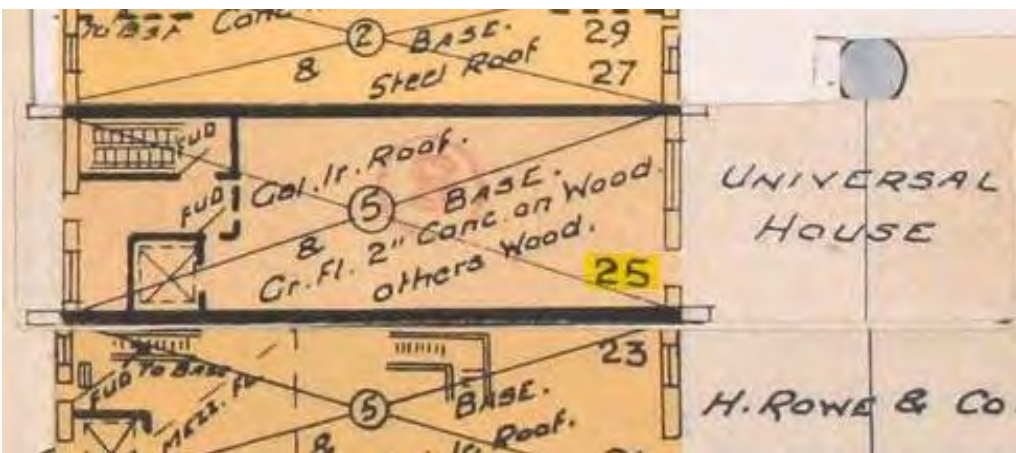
Section taken from a 1948 Mahlstedt plan shows interior alterations including the repositioning of the lift and stairwell and the closing up of interior openings between no 25 and 27-29 Elizabeth Street. (Source: Mahlsted Map, no 15, 1948)
